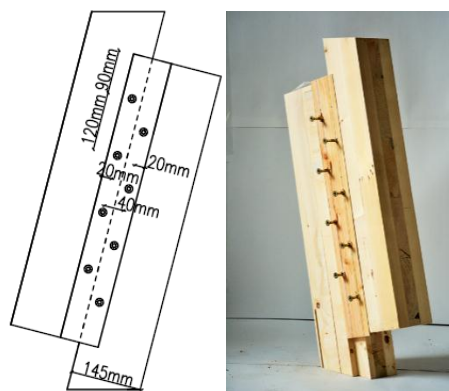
Surface spline joints with STS in shear (layout and specimen)
